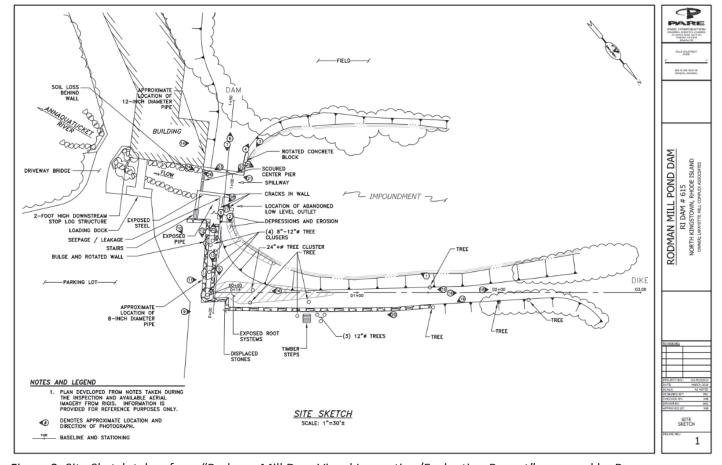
Site Sketch taken from "Rodman Mill Dam Visual Inspection/Evaluation Report" prepared by Pare Corporation following a March 20, 2018 dam safety site inspection. Sketch depicts the impoundment, dam and spillway structures, and infrastructure owned by Mr. Baker including a building in close proximity to the spillway and a driveway bridge that crosses the river downstream of the dam.
